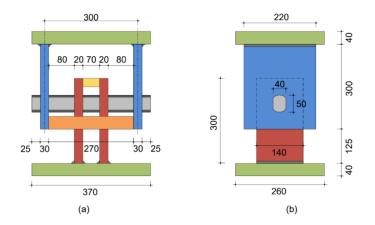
DRD1 first campaign geometry: (a) top view and (b) side view, dimensions in mm.
